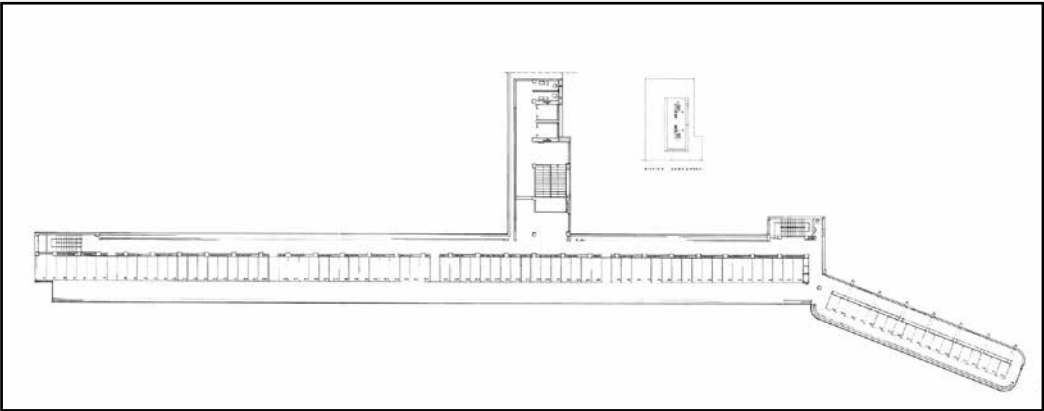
Main building sun deck plan in December 1929. Drawing No. 50–63. The drawing has been edited. AAM.
